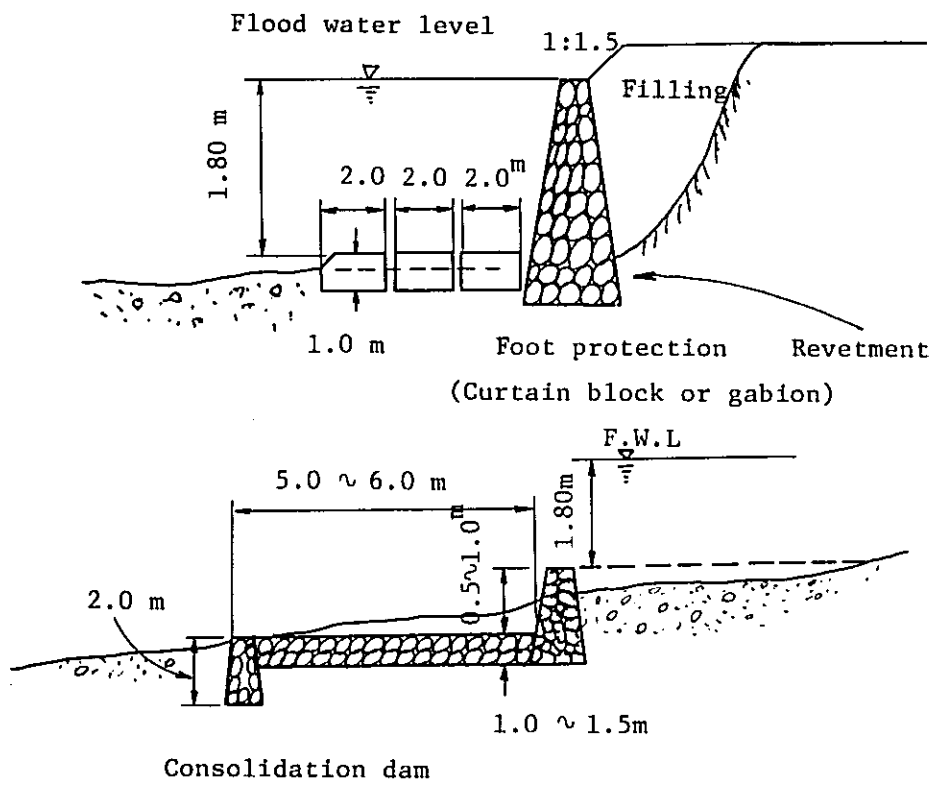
Planned Cross Section Adjacent to Kawayan Bridge
